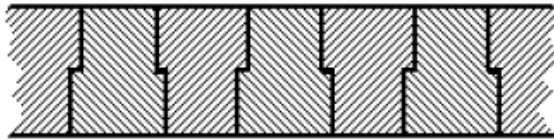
Longitudinal Elevation View of the Roof Blocks
